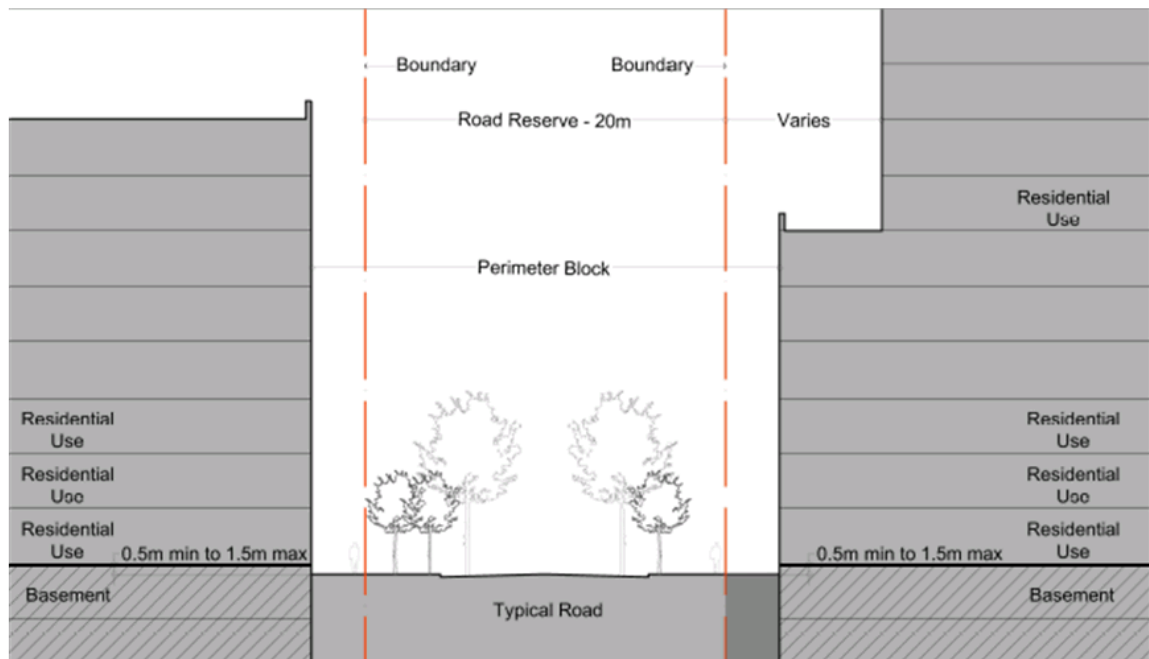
Street Wall Height at Typical East West Street, NTS
